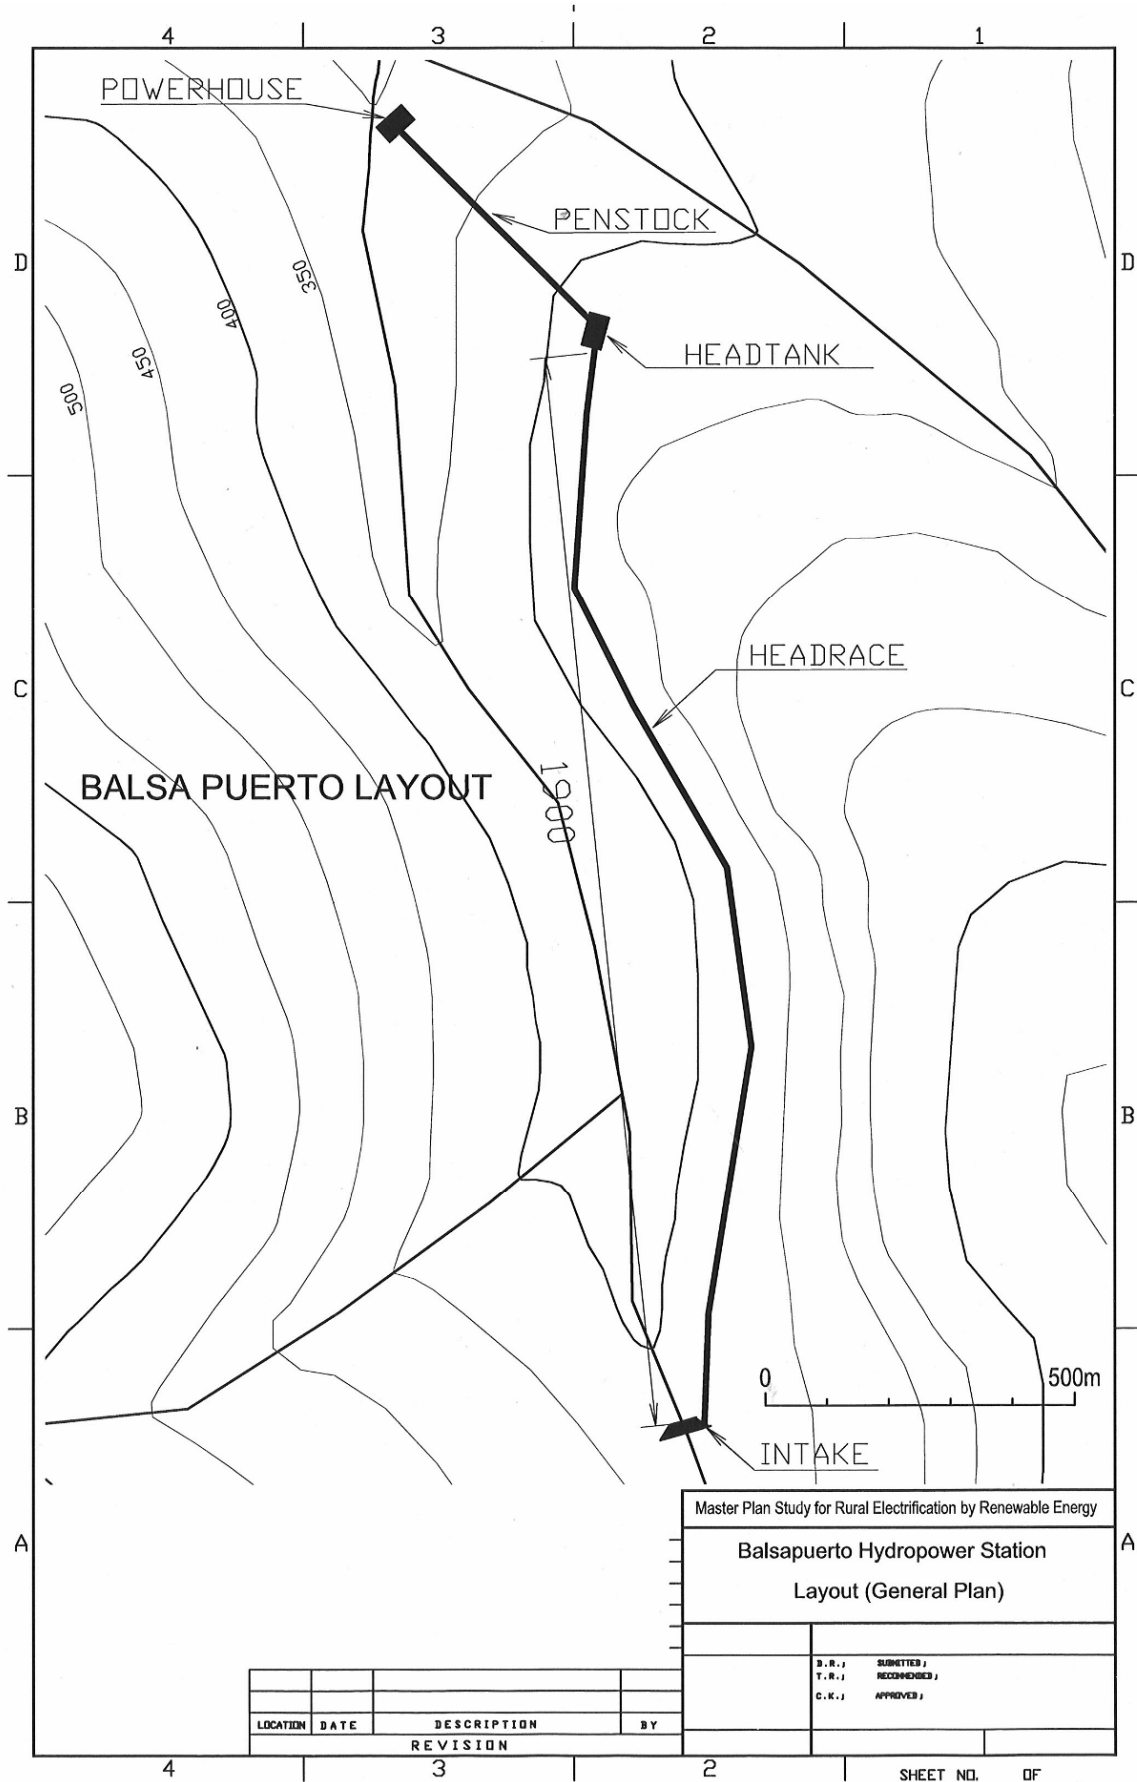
Layout of Power Station (Plan)
